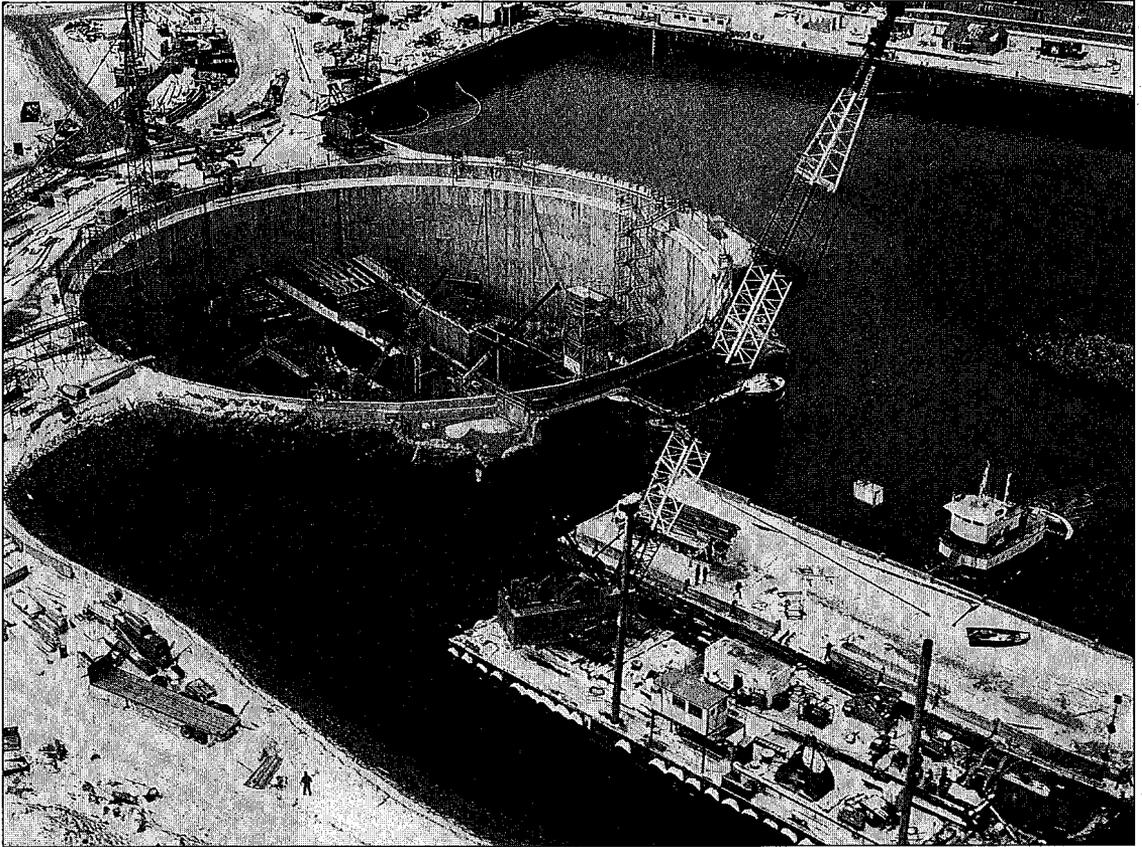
An aerial view of the cofferdam after the ITT tunnel section has been placed in the excavated trench. Note the secondary cofferdam and the circular steel access shafts for the tunnel adjacent to the cofferdam.
